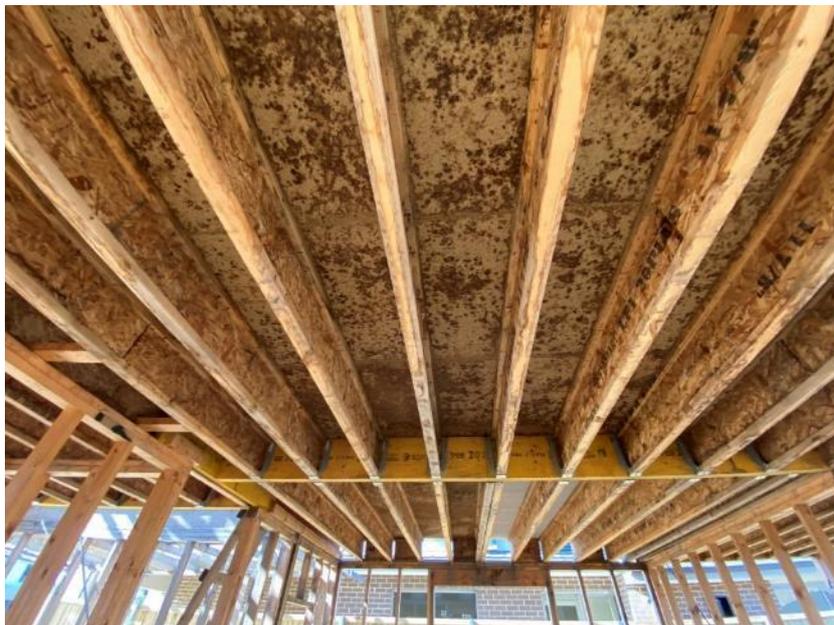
Mould and water damage to the particleboard flooring to the first floor.
